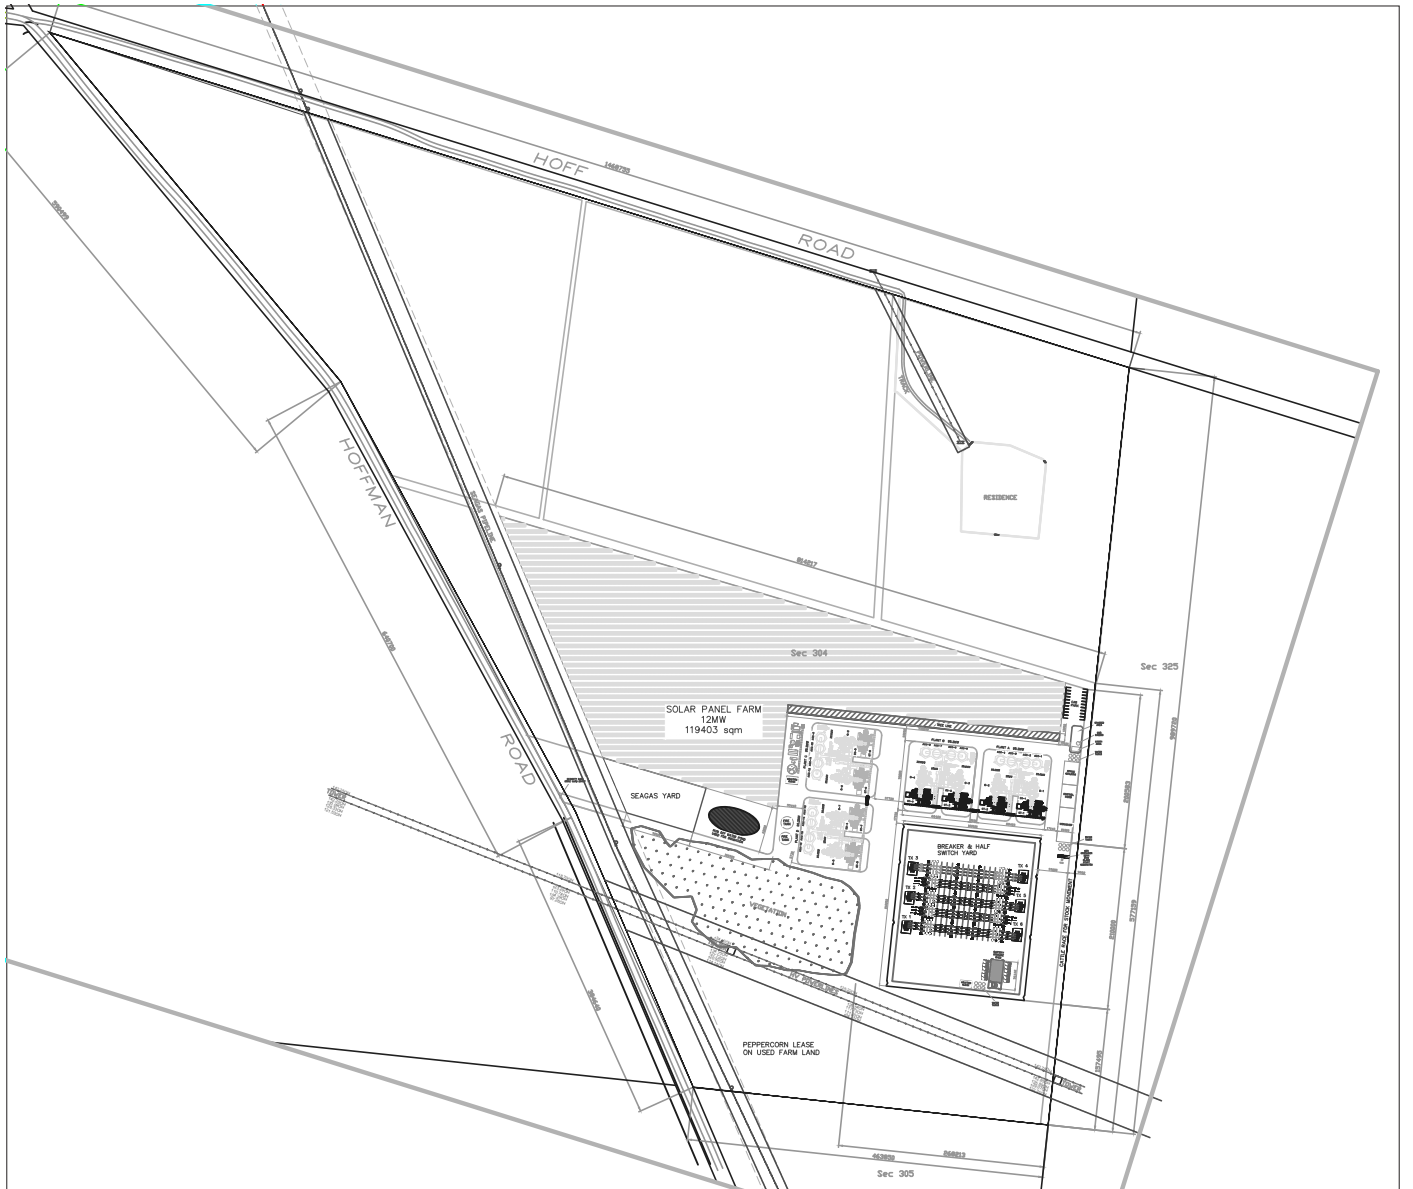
Plan showing the proposal layout (Source: SAPGen)
